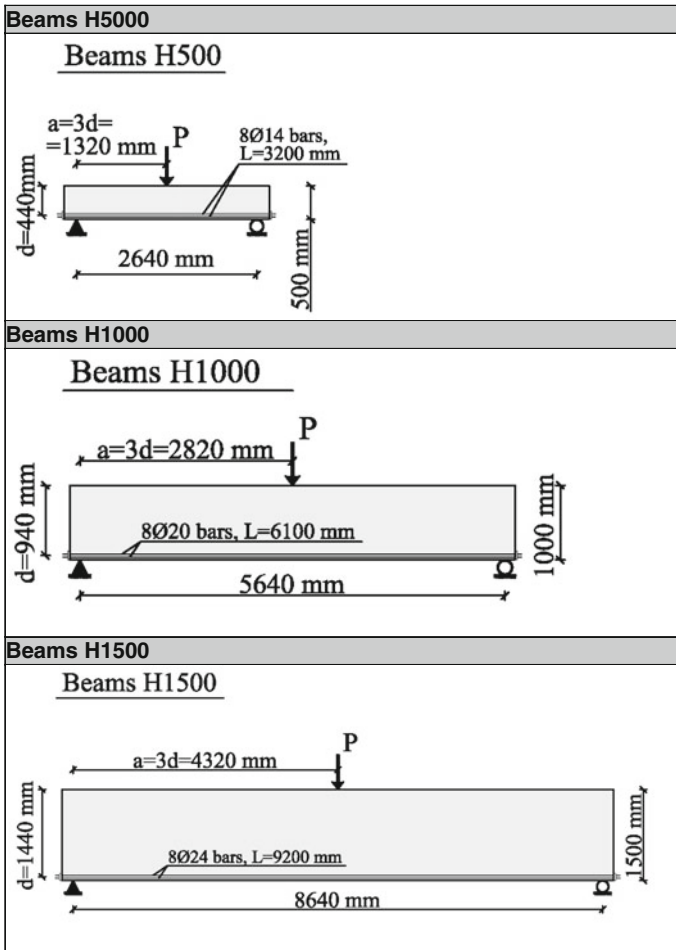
Geometry and reinforcement details of beams (Frontal view)
